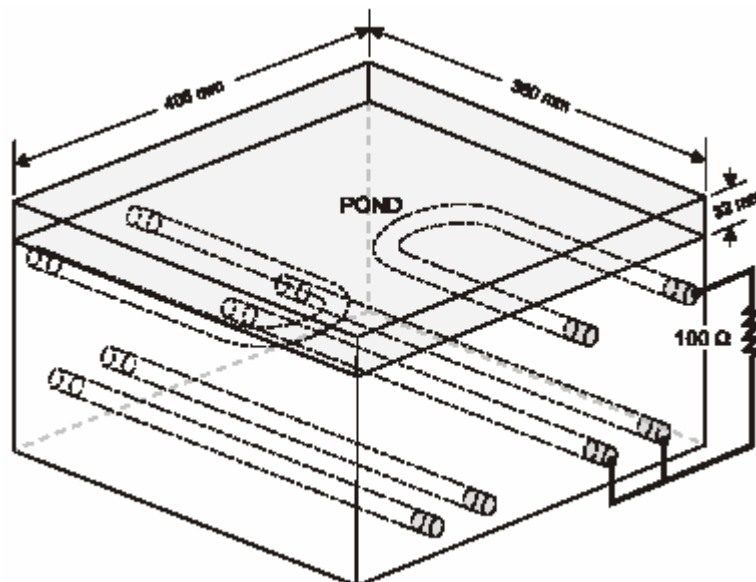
Three Dimensional View of Test Setup for VTRC Corrosion Tests (Clemena 2003)
